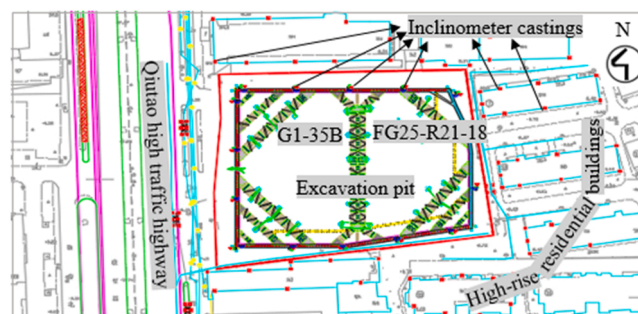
Triumph Unit project plan view showing the excavation pit, surrounding environment, and the inclinometer points for monitoring purpose.
